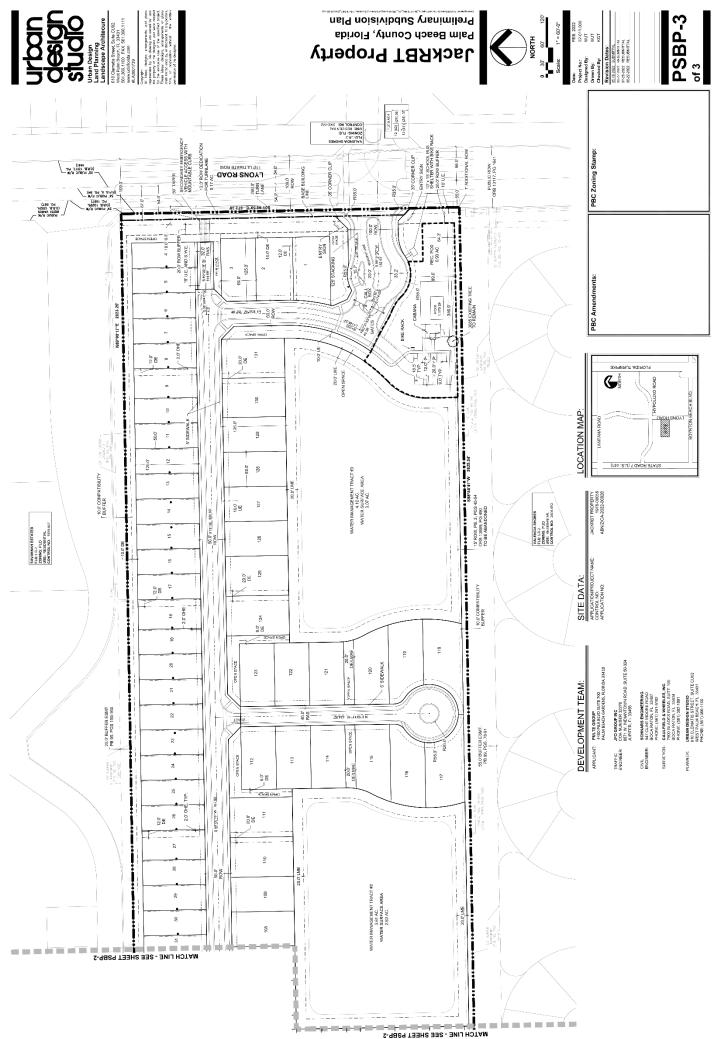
Preliminary Subdivision Plan Sheet 3 of 3 dated (September 15, 2022)
